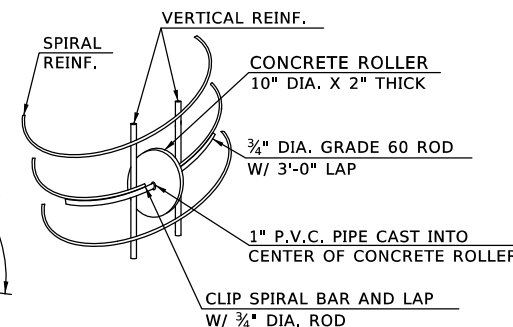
DETAIL OF DRILLED SHAFT ROLLER PLACEMENT
